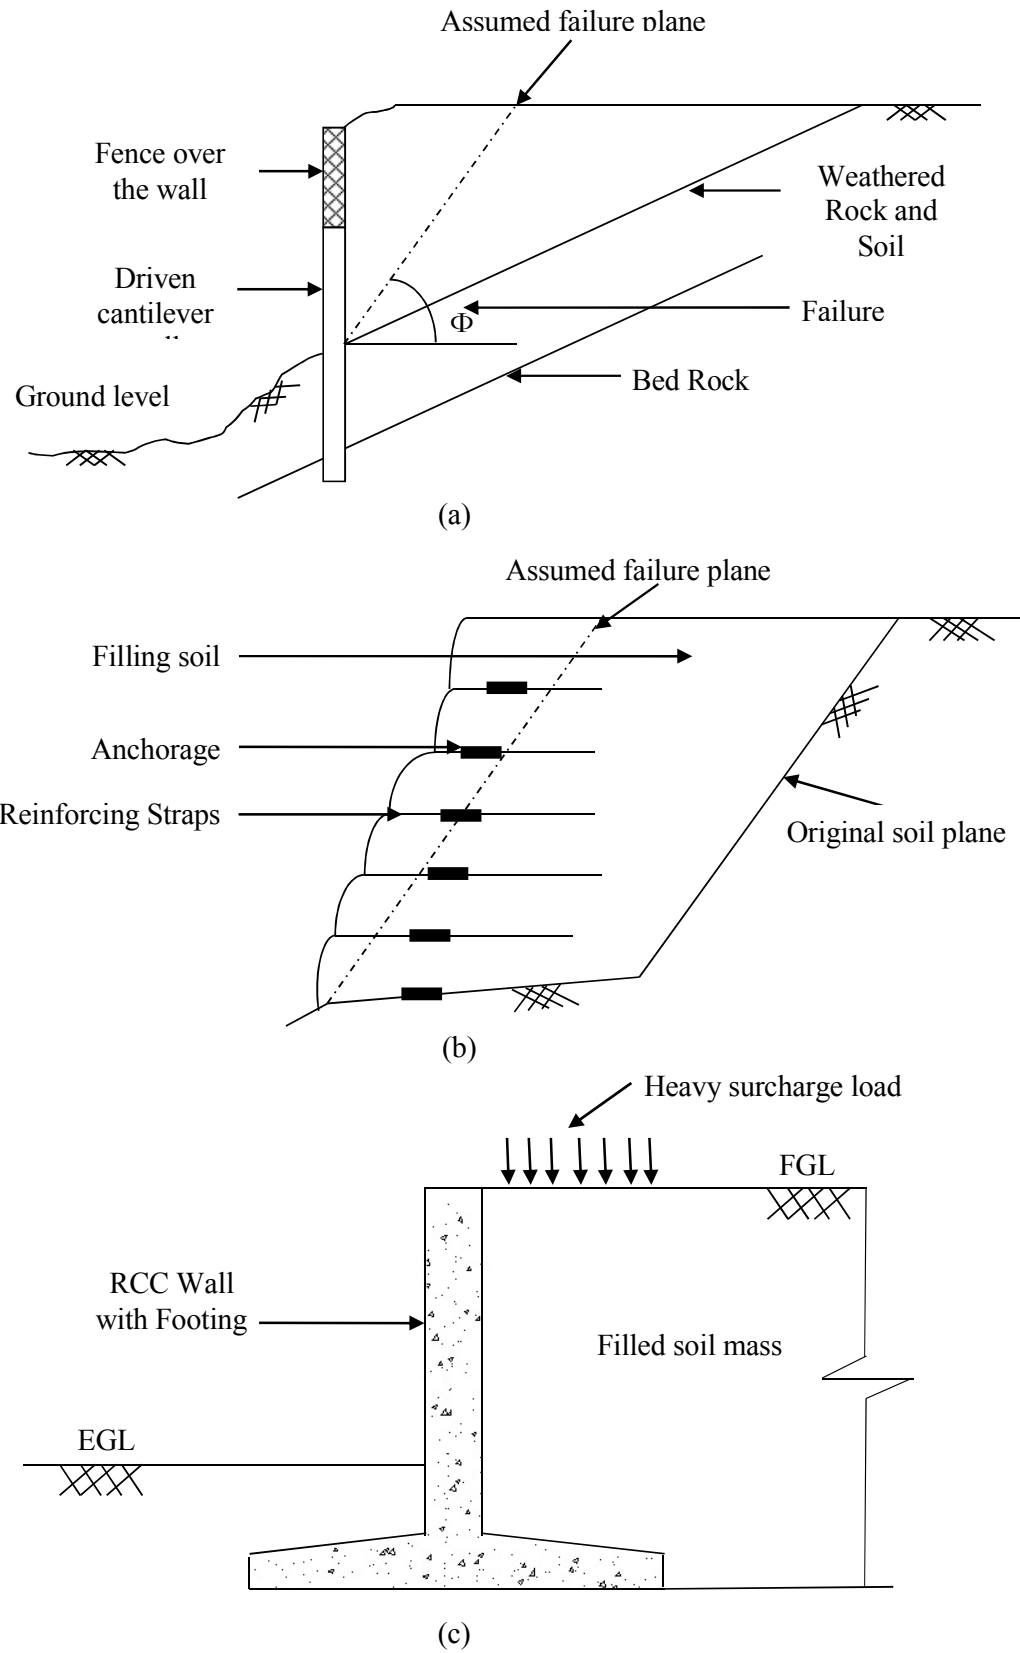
Different slope protection method (a) driven cantilever wall; (b) reinforced earth wall; (c) RC Wall with footing.
